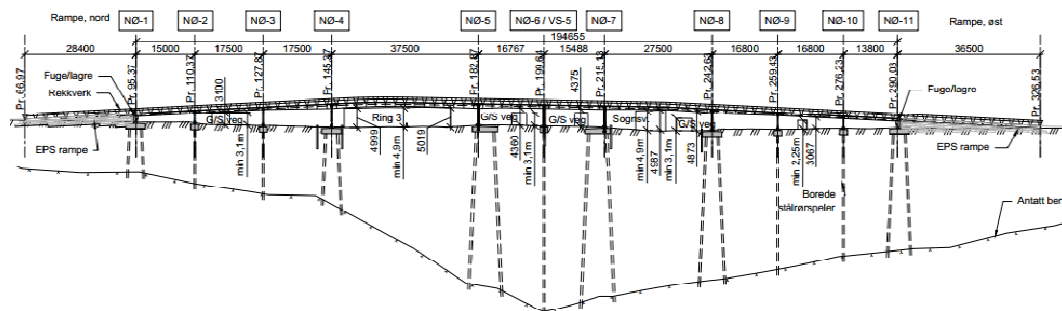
Longitudinal section for the bridge, stretching from the north end to the east end.
